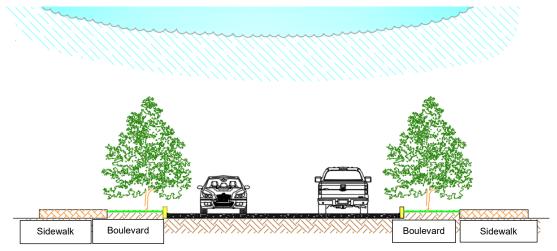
A sketch illustrates the idea of separating sidewalks from roads
